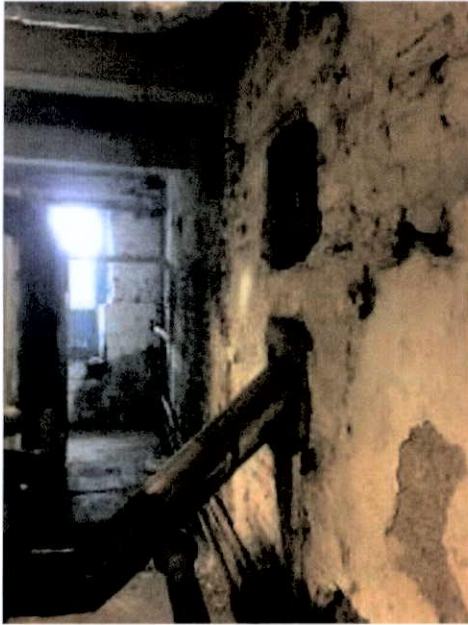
Former kitchen to northwest at basement level, with original masonry and floor flags evident. Note concrete downstand beam for concrete floor plate supporting entrance level above
